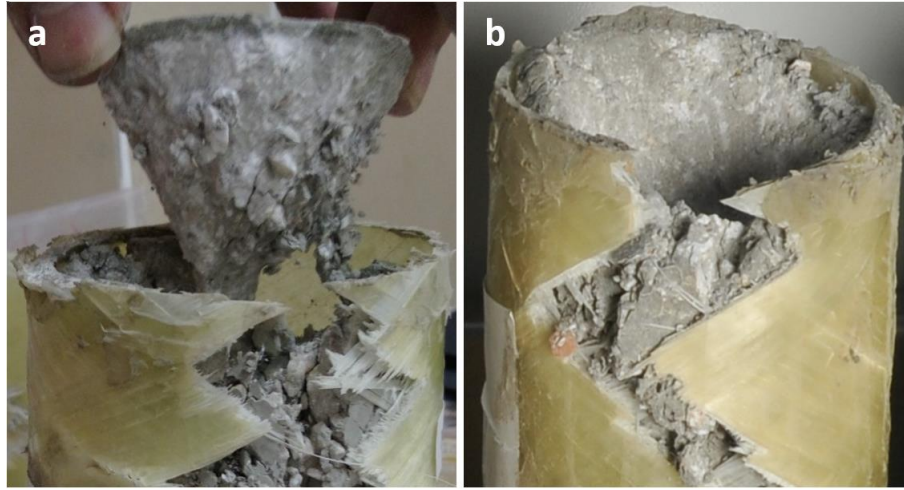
Truncated pyramids with 45° angle on concrete core a) Top of the concrete specimen b) Bottom of the concrete specimen
